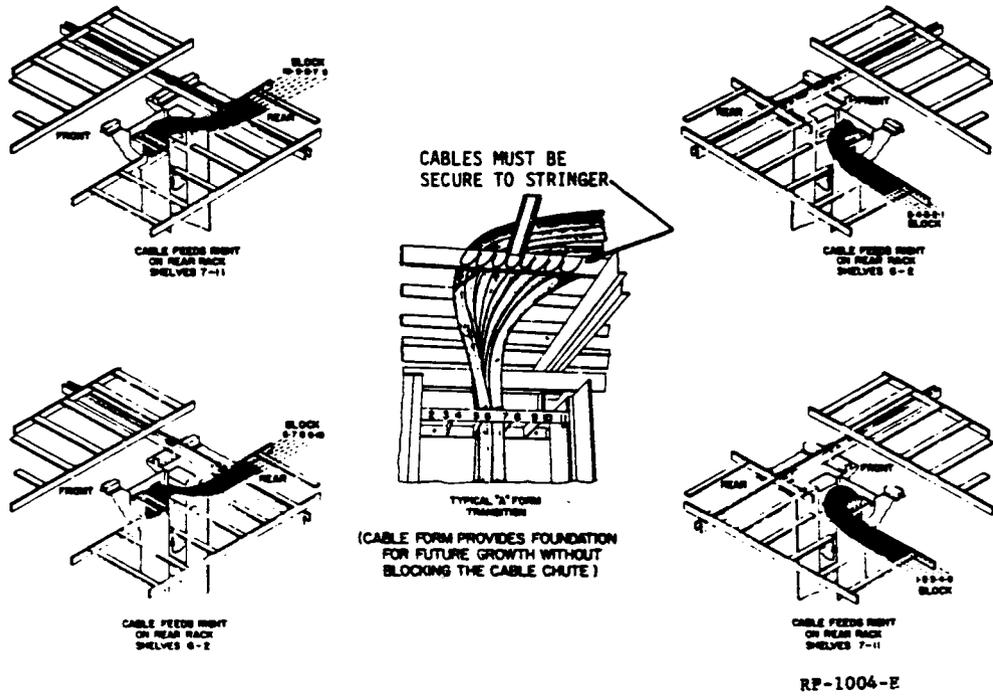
B CABLE CHUTE TRANSITION TO REAR RACK
